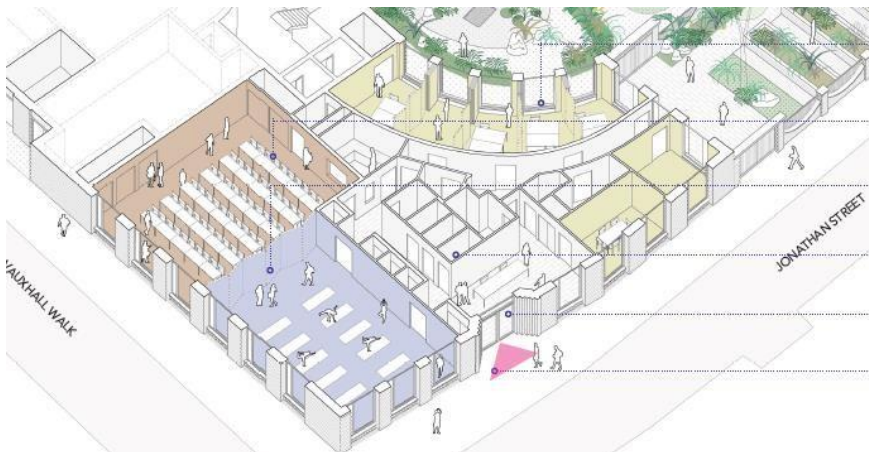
Carmelita Centre layout (source: Design and Access Statement)
